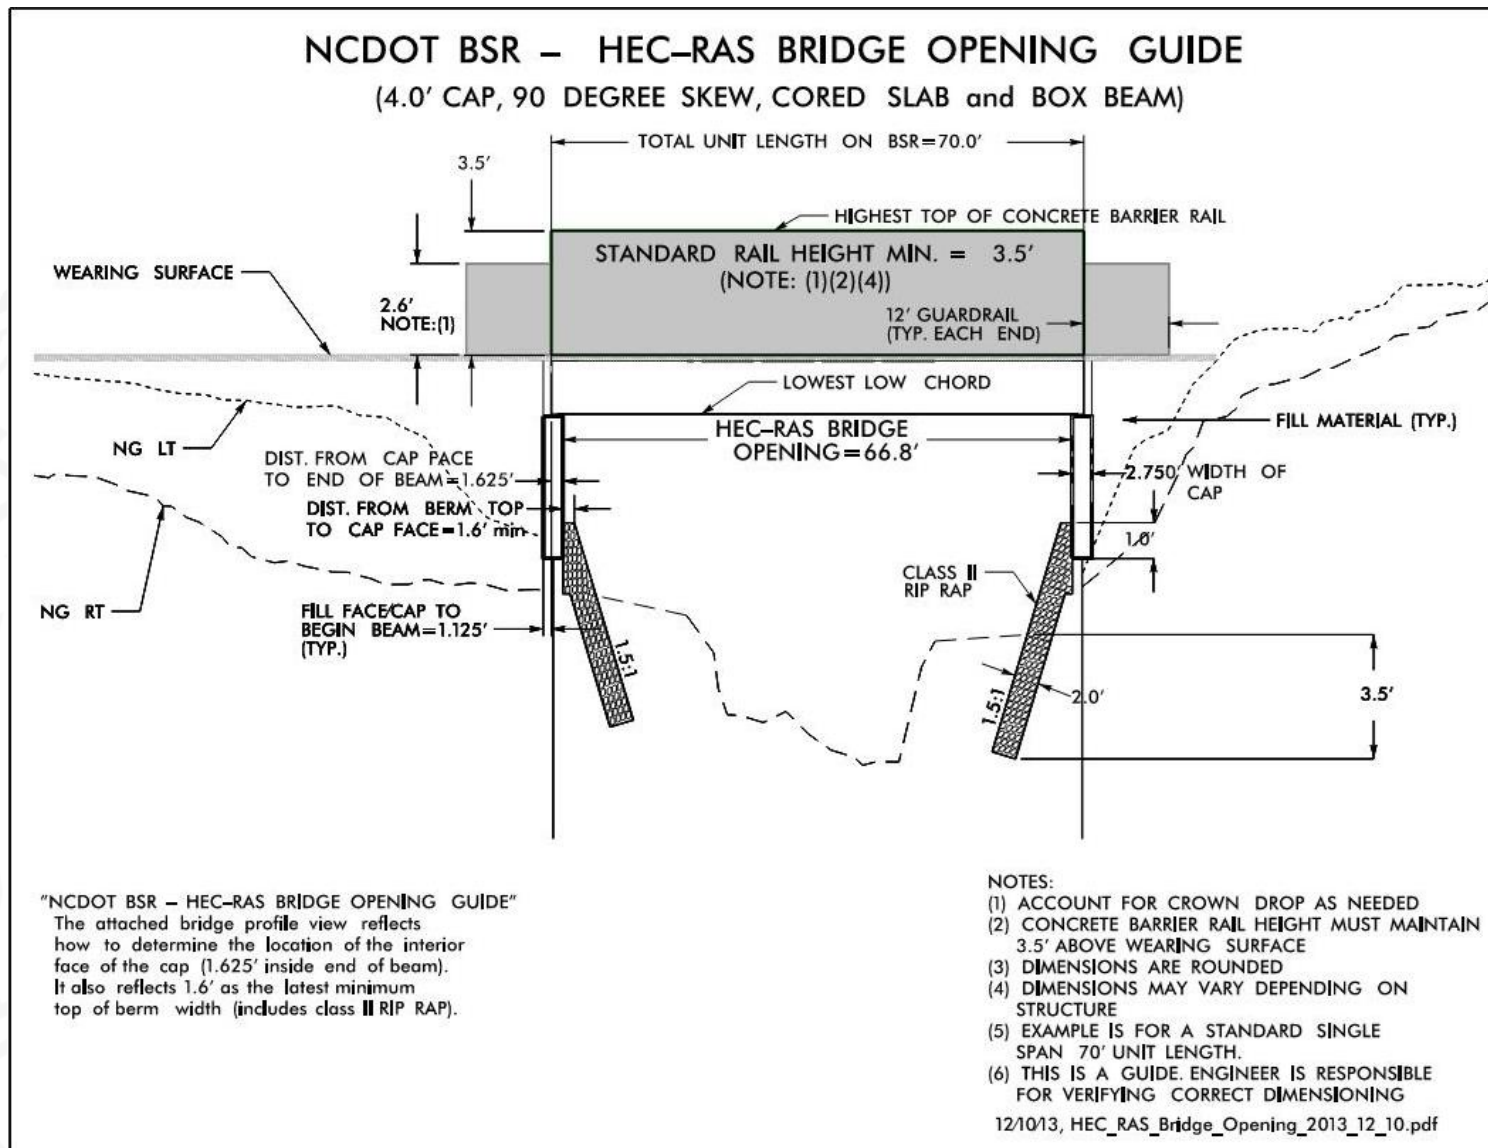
HEC-RAS Bridge Opening Guide (4.0' Cap)
